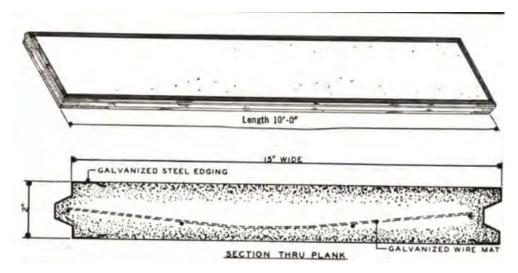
Metal edge gypsum roof plank (ref: United States Gypsum historical product data)
